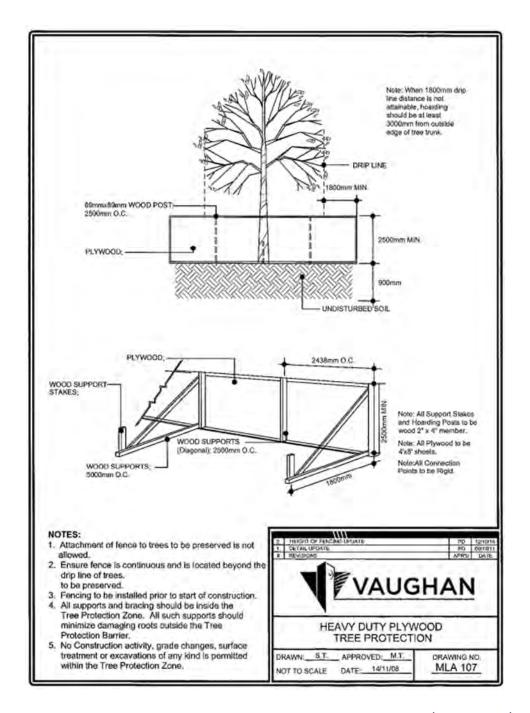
Heavy Duty Tree Hoarding Protection Detail (Plywood)
